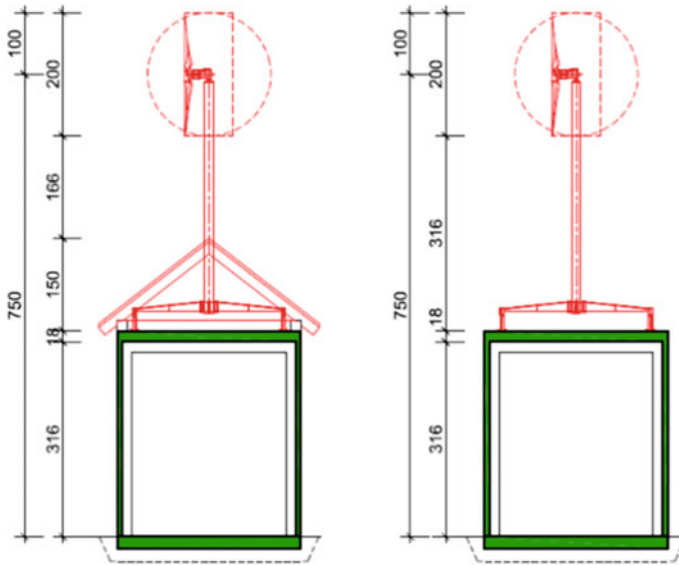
Building with gabled and flat roof (dimensions in cm)
